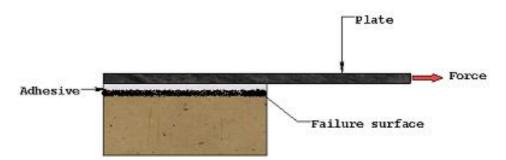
(c): Adherend failure, i.e. concrete shearing
